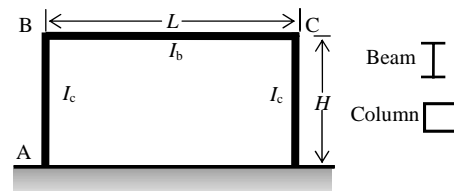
One-storey one-span plane frame consisting of beam of wide-flange cross-section and column of square-tube cross-section
